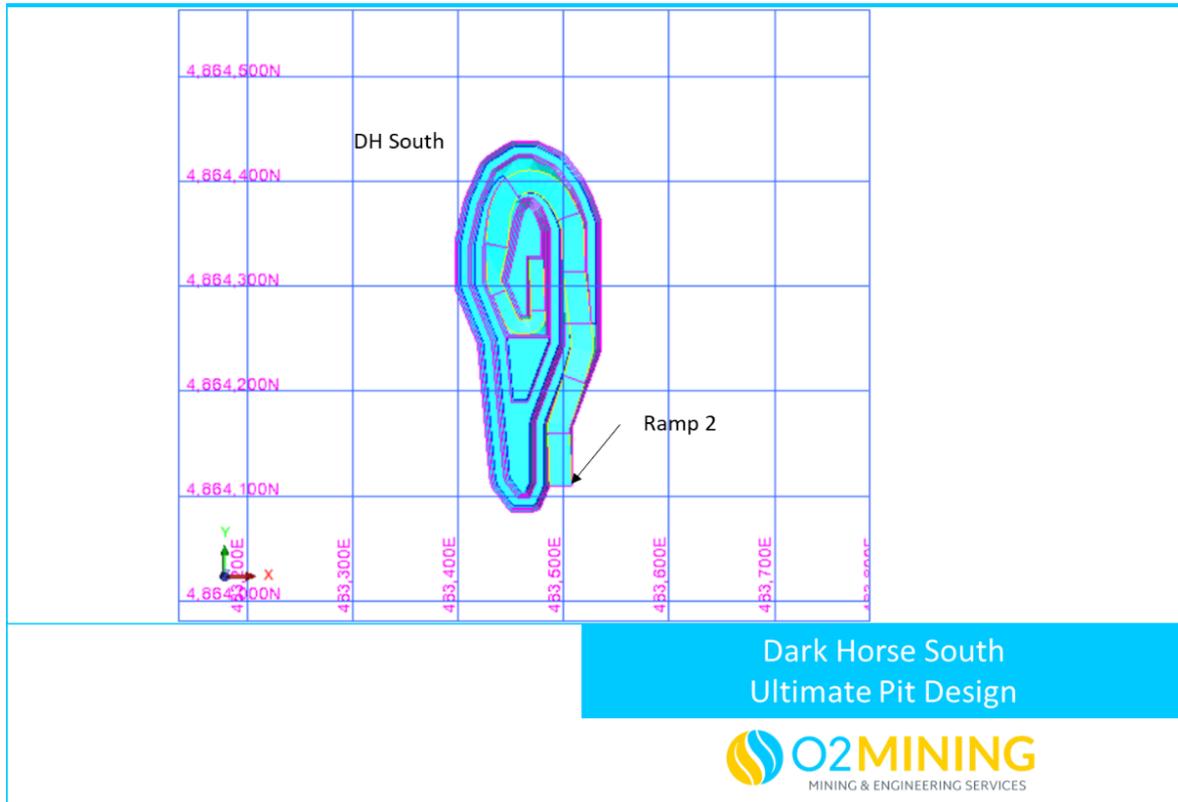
DH South Ultimate Pit Design – Plan View (Source O2 2023)
